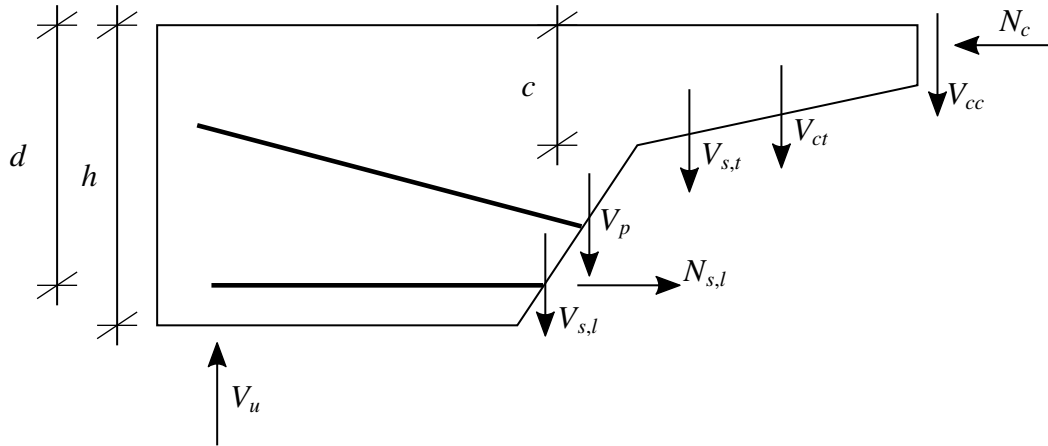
Shear bearing mechanisms within a reinforced concrete beam
